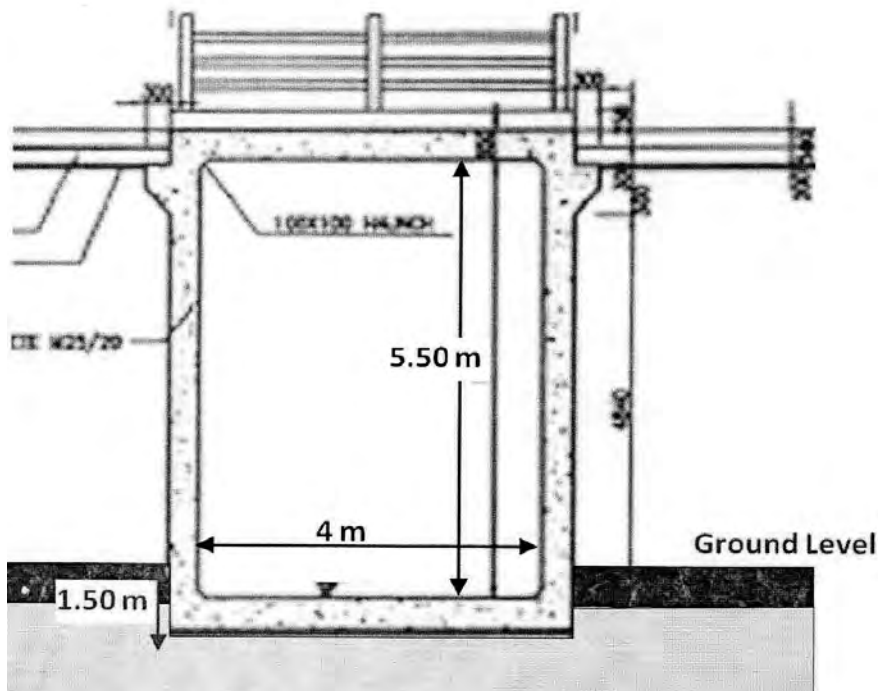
Longitudinal Section View of the Underpass (Source: DoR)
